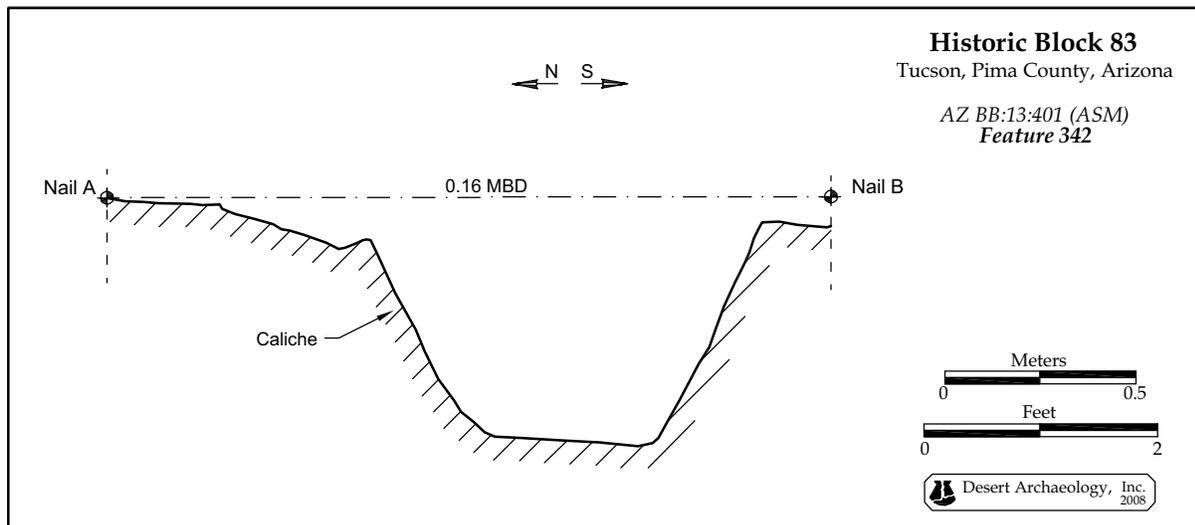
Cross section of Feature 342, an outhouse pit.
